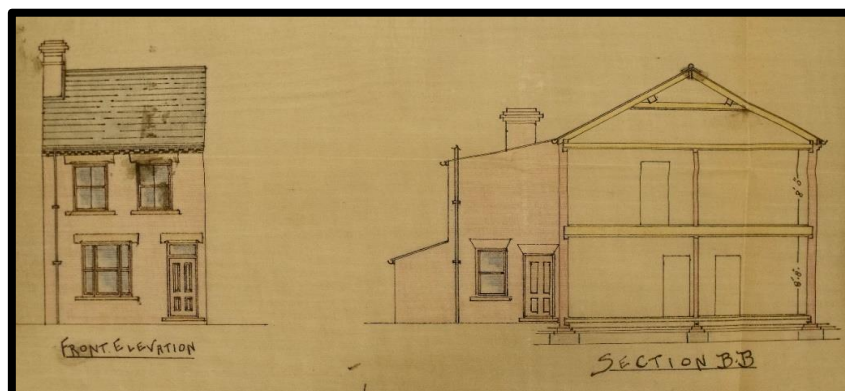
No. 2 Madras Road, proposed front elevation and section (CA CB/2/SE/3/9/662).
